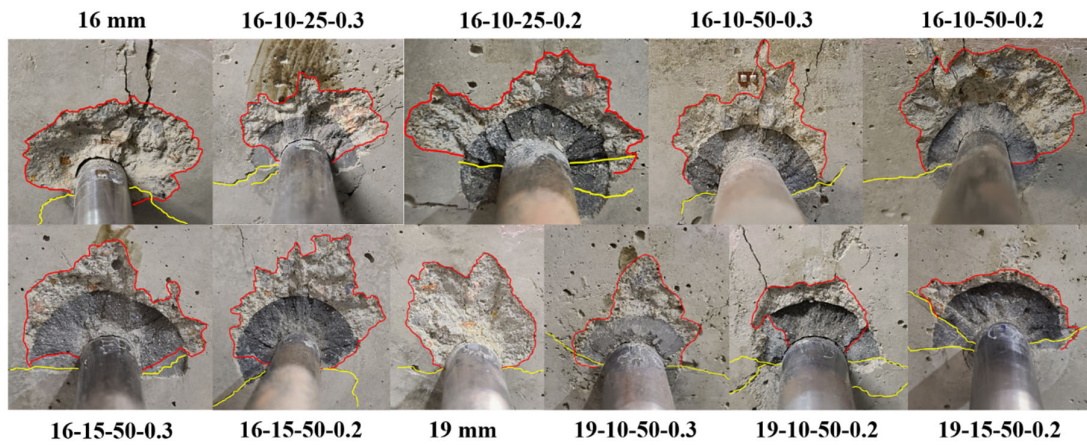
Localised concrete crushing (red lines) and tensile cracks (yellow lines).
